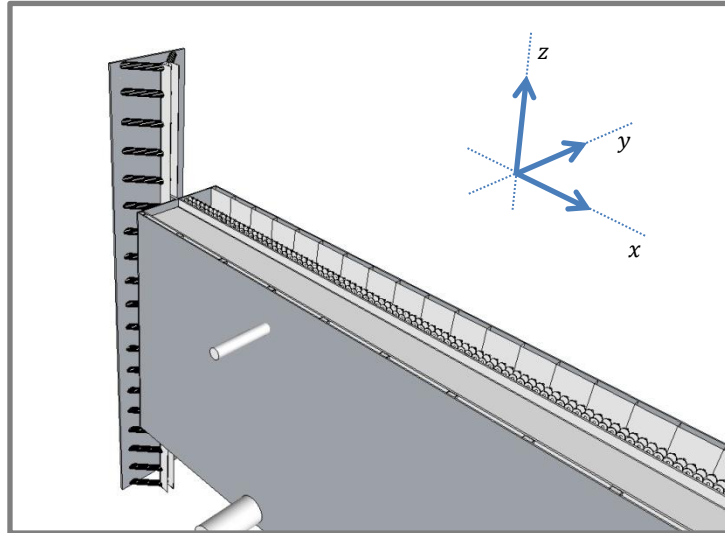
Overview of sliding movable sill in rail connected to lock wall.
